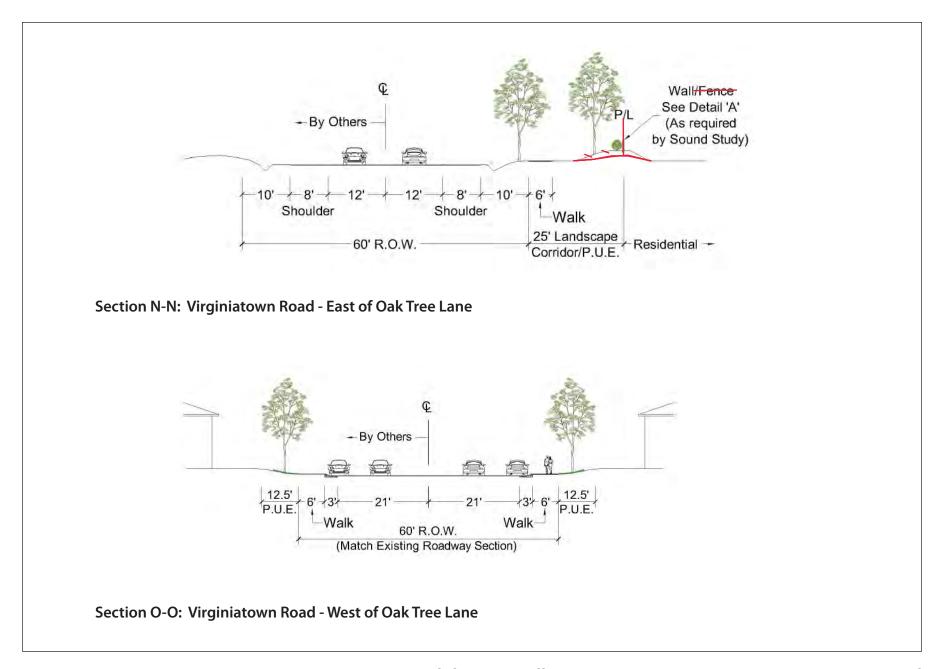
Collector Street Cross Sections - Virginiatown Road
